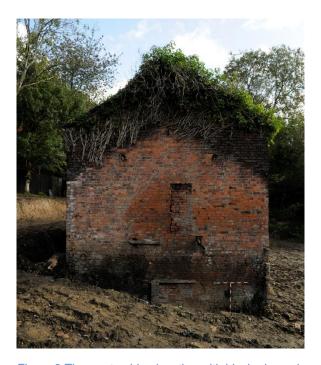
The west gable elevation with blocked opening and scar of former roof line
